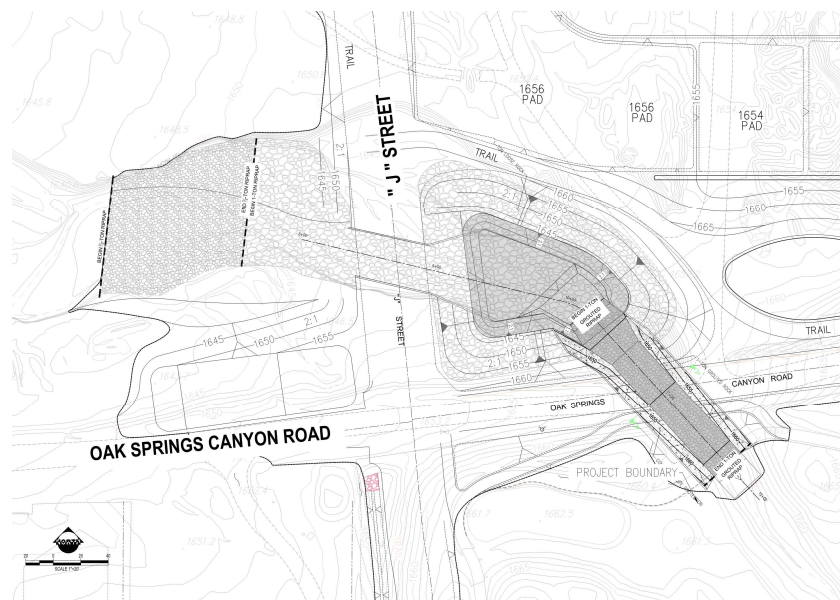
Original Design at Oak Springs Canyon Road Culvert and Future J Street
